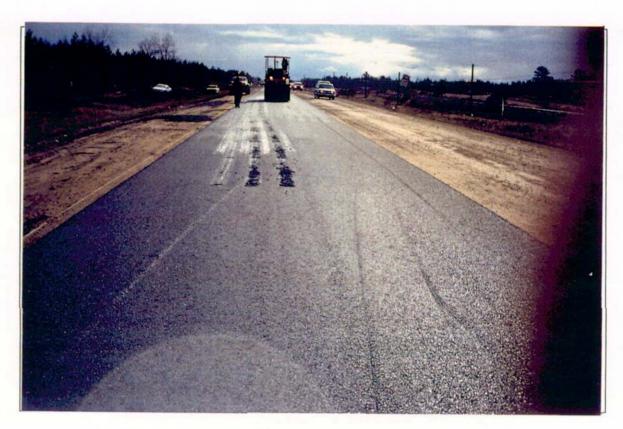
Illustrating pick-up of binder course in section 3, a PG 58-34 with polymer modification
